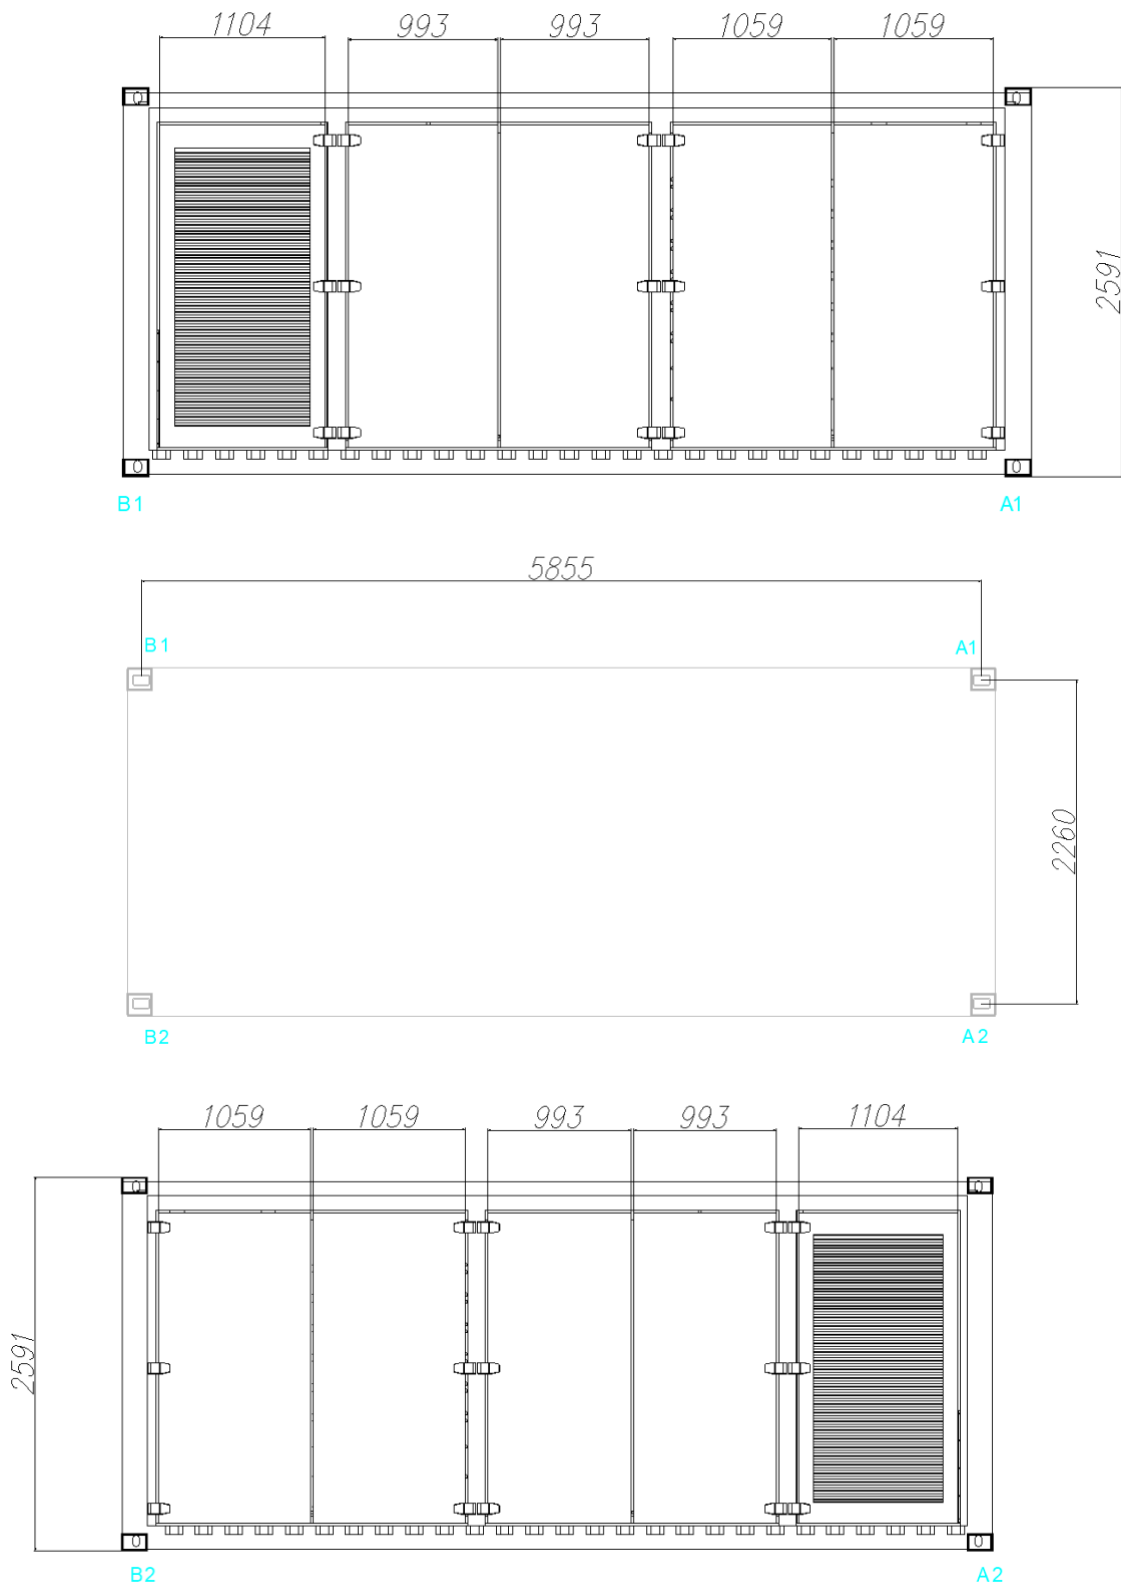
A1 A2 B1 B2 four supporting point in foundation
